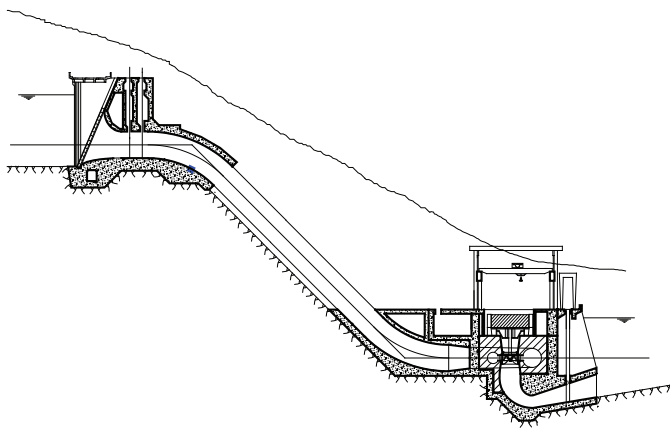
Project with river diversion through an open channel (Erveira hydropower plant).
